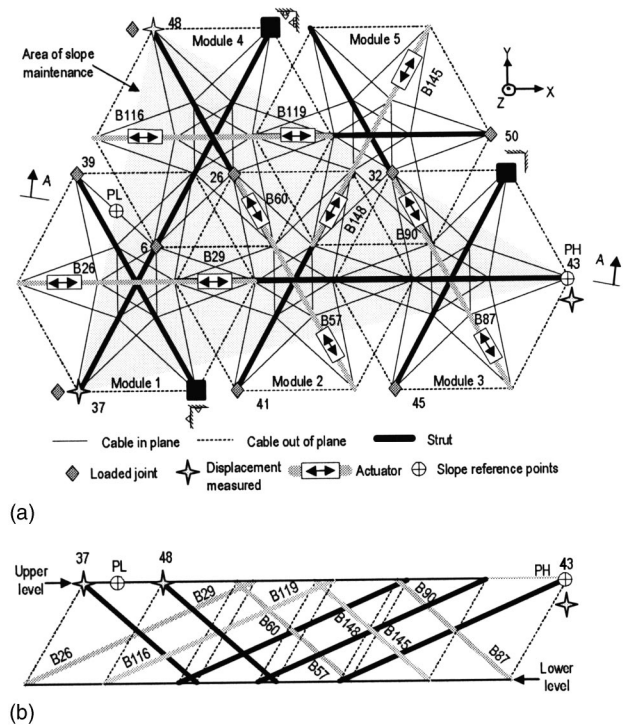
Schematic of the structure: (a) plane view of sensor, load and control area location and (b) elevation view of sensor, load, level, and slope reference joint location
